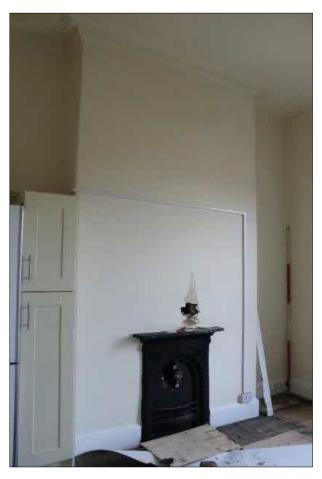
(shot 81): Retained fireplace along the southwest wall in room 1.5. Looking west-northwest, 2m scale
